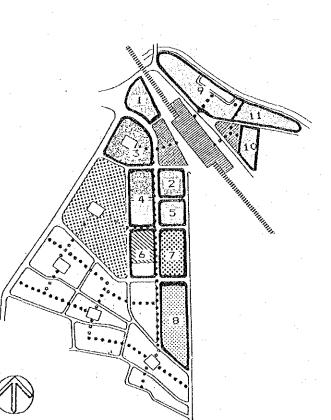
BLDG. CONSTRUCTION SITE LAYOUT
